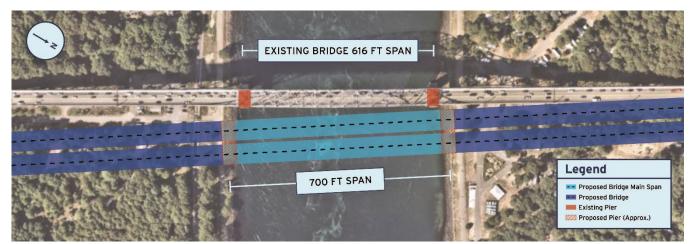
Main Span and Pier Location Out-of-Water Option – Approximate 700-Foot Span Length
